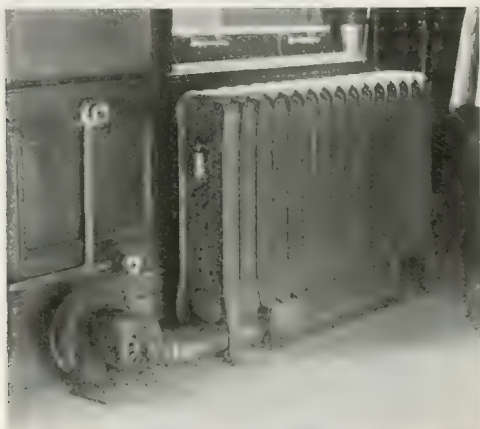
BLOWER OUTFIT IN CONNECTION WITH A RADIATOR ALREADY INSTALLED
